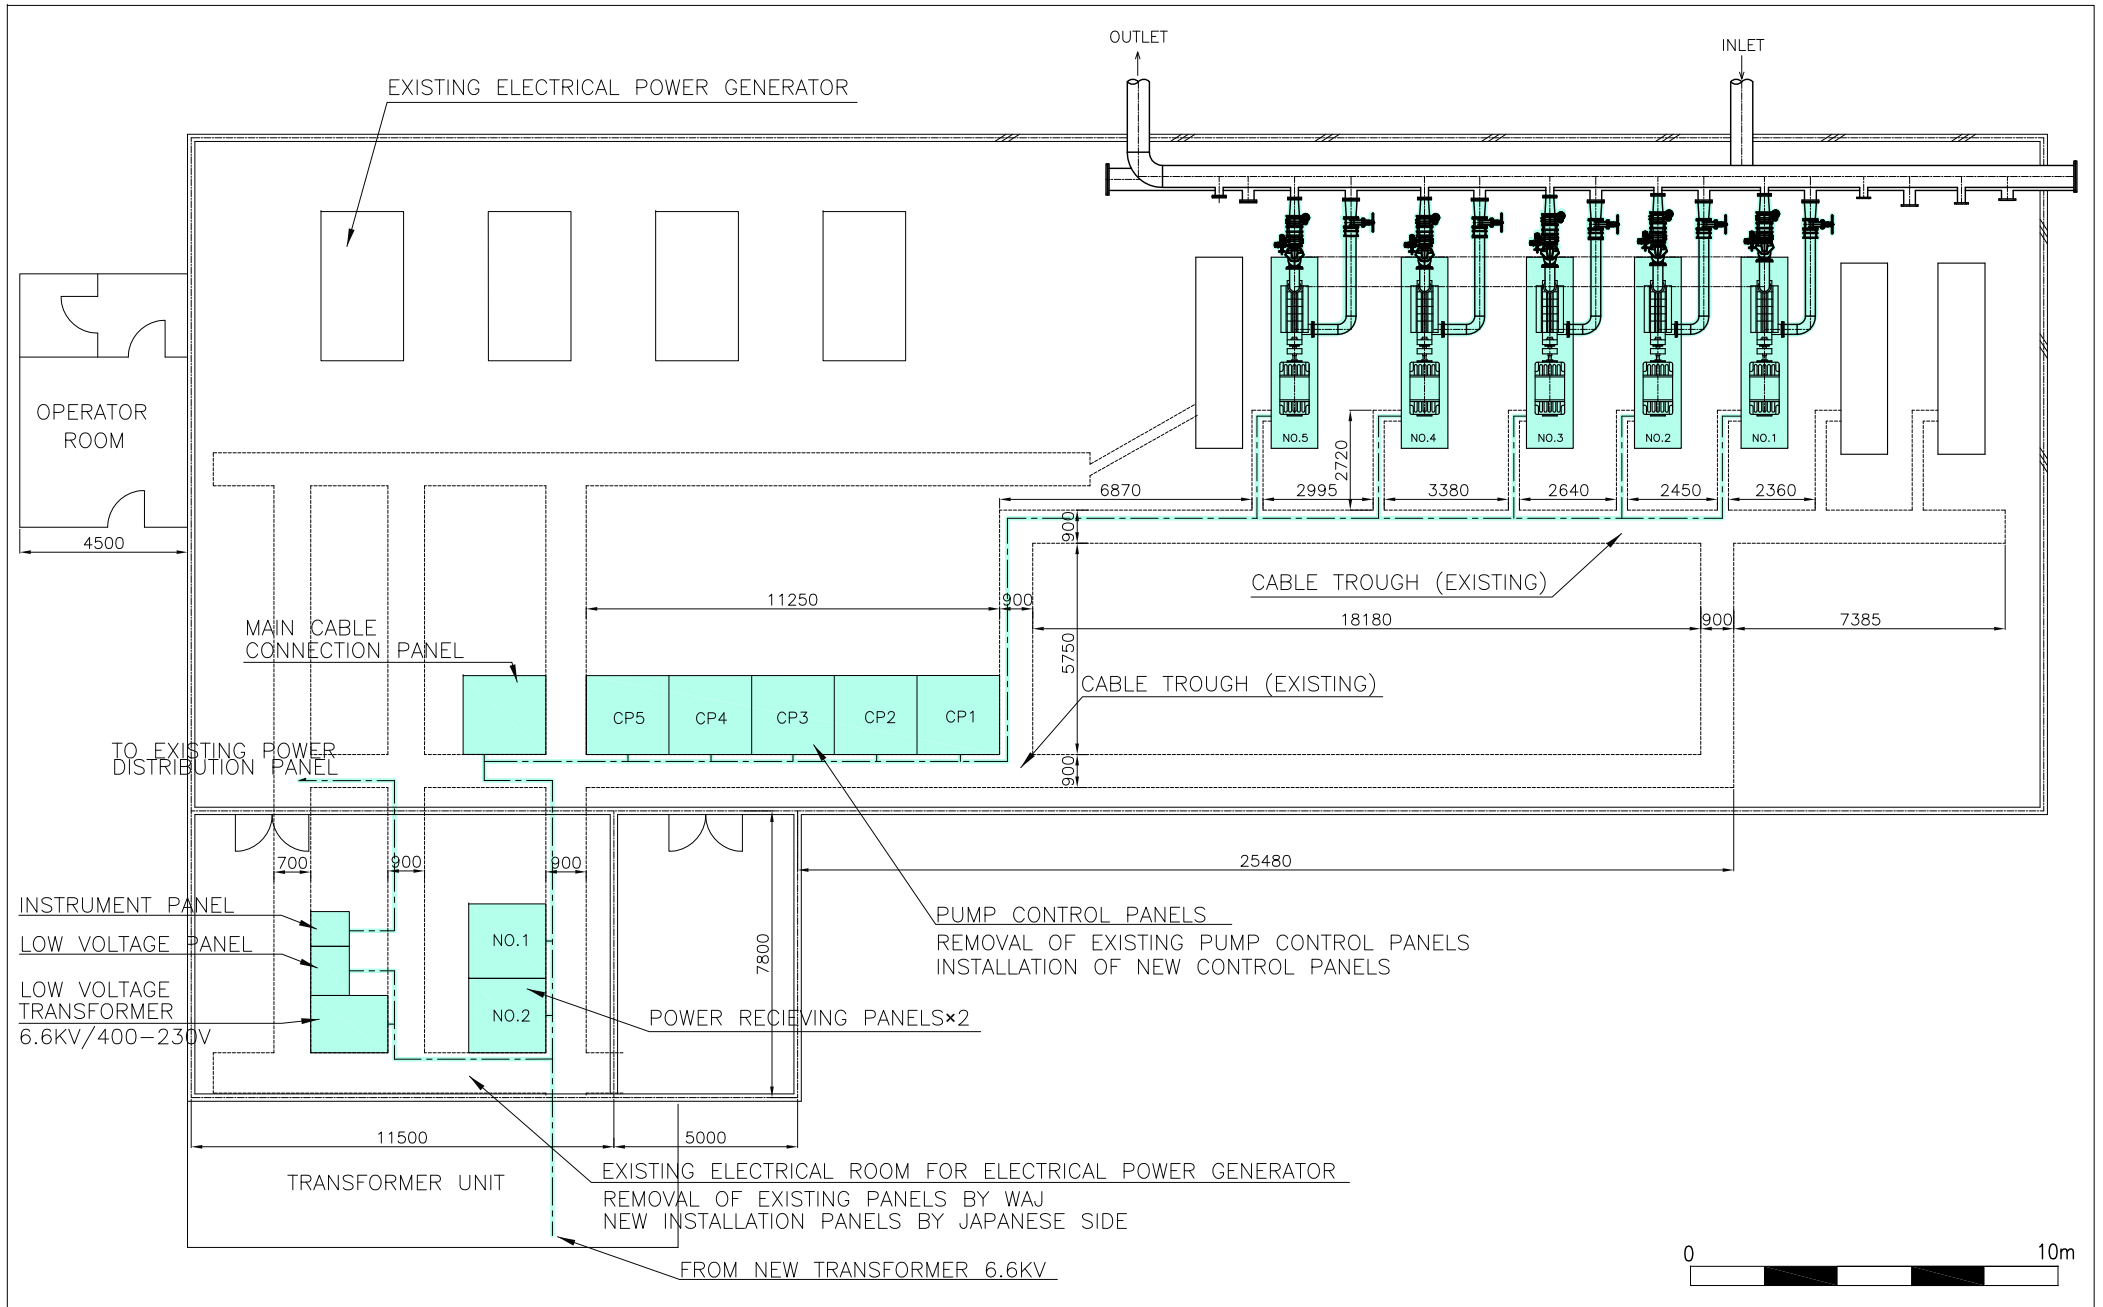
Installation Plan of Electrical Equipment of Azraq Pumping Station
